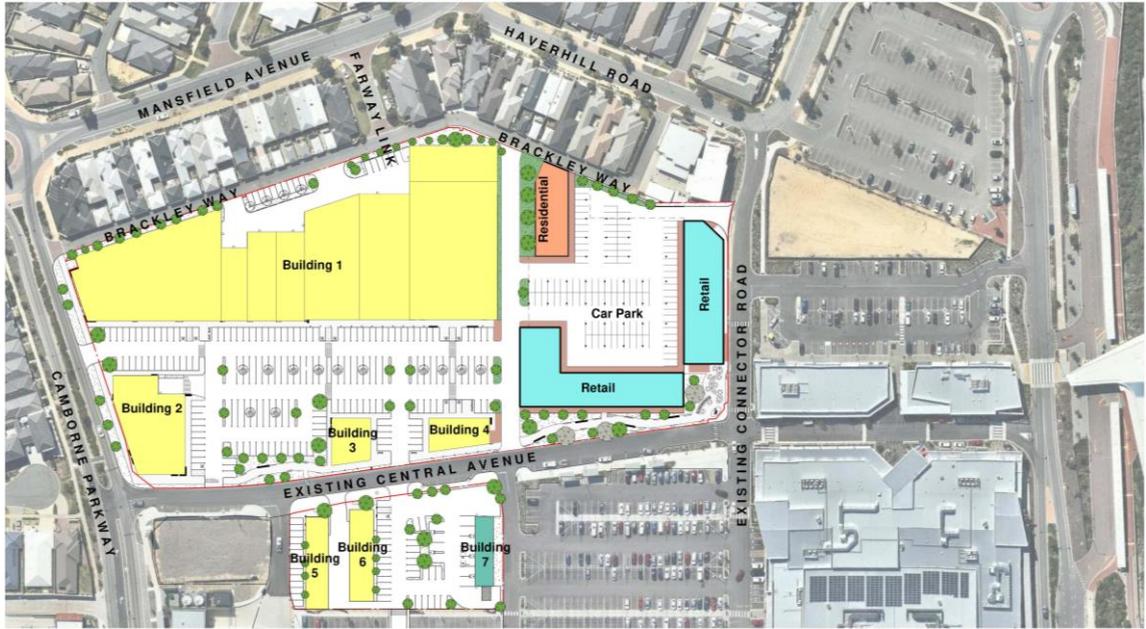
Indicative Redevelopment – Stage 1 Ground Floor
